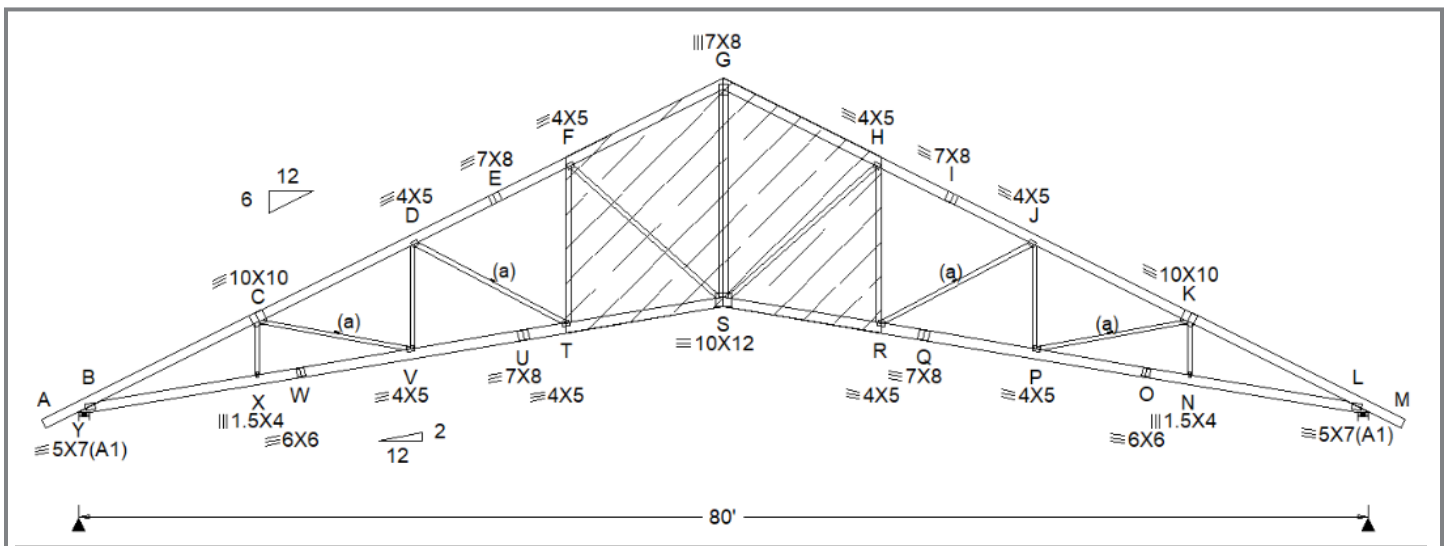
Two-ply jack-scab truss connected to 40-ft truss halves diagram.
